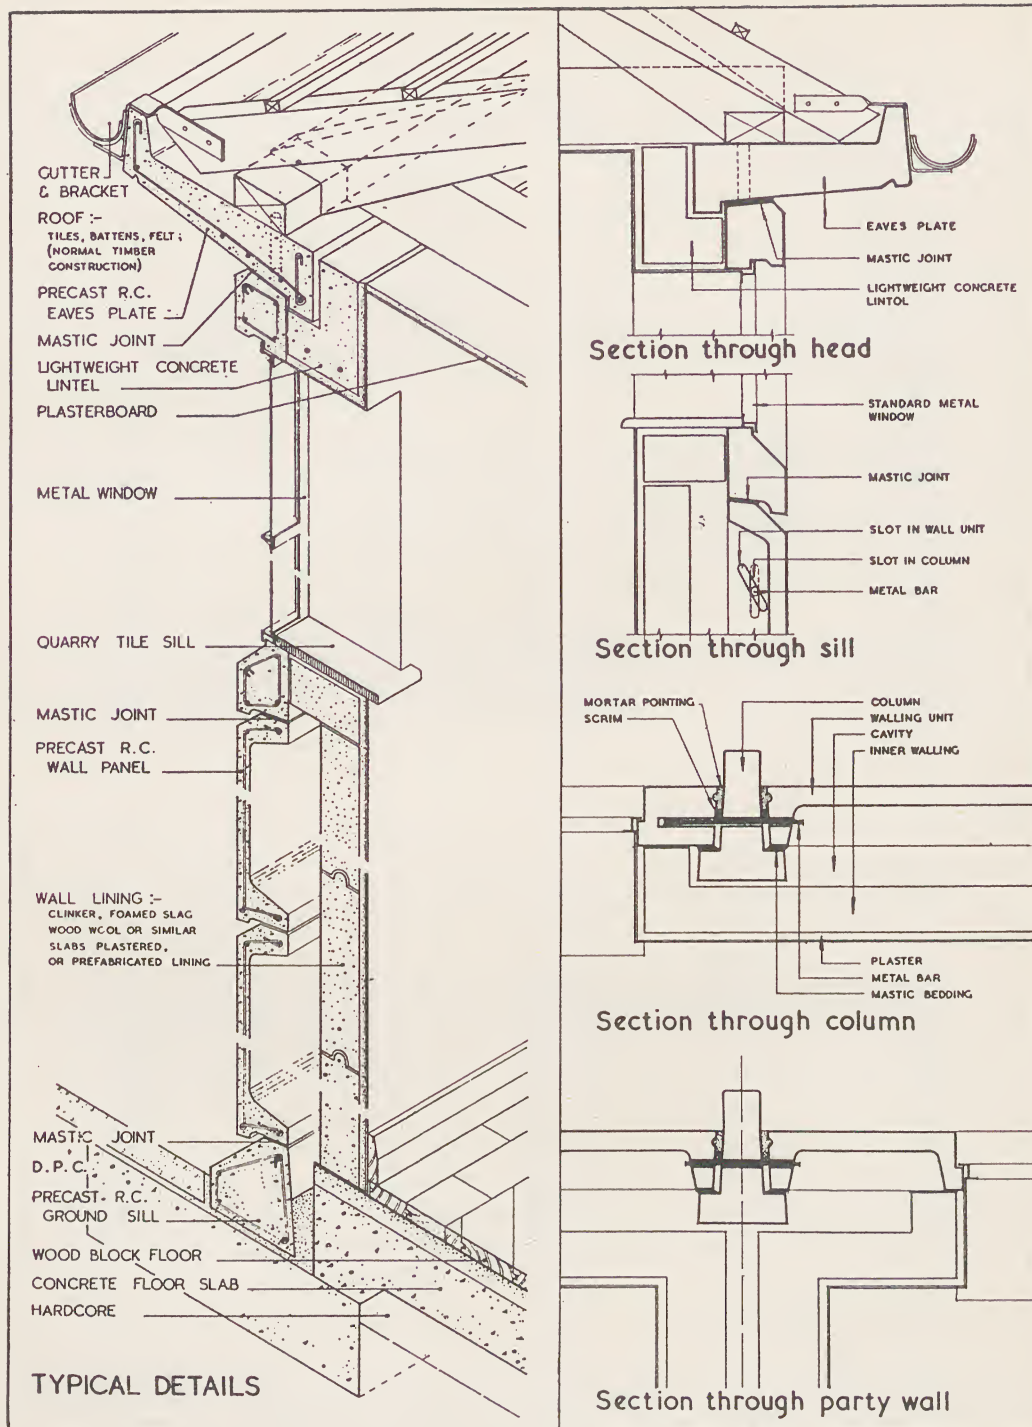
The B.C.C.F. system of pre-cast concrete bungalow construction. Typical details.
